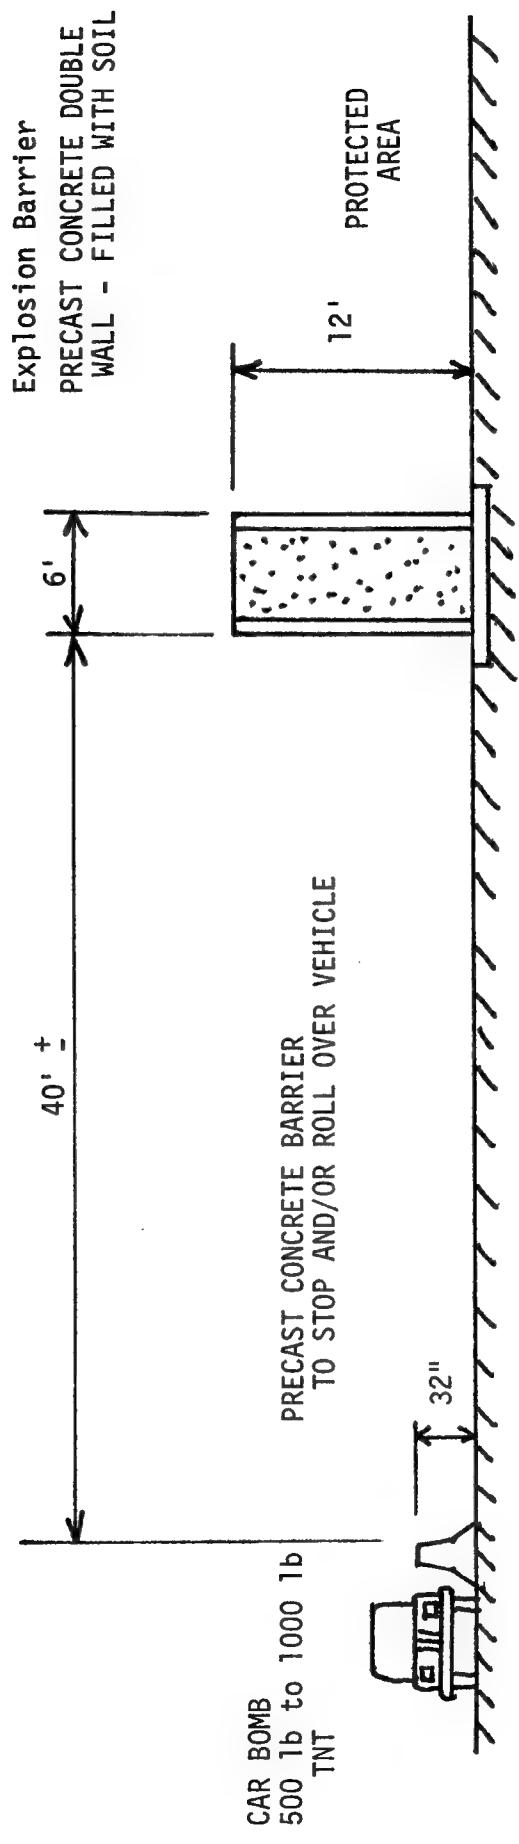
COMBINATION TRAFFIC BARRIER AND CONCRETE DOUBLE WALL EXPLOSION BARRIER
